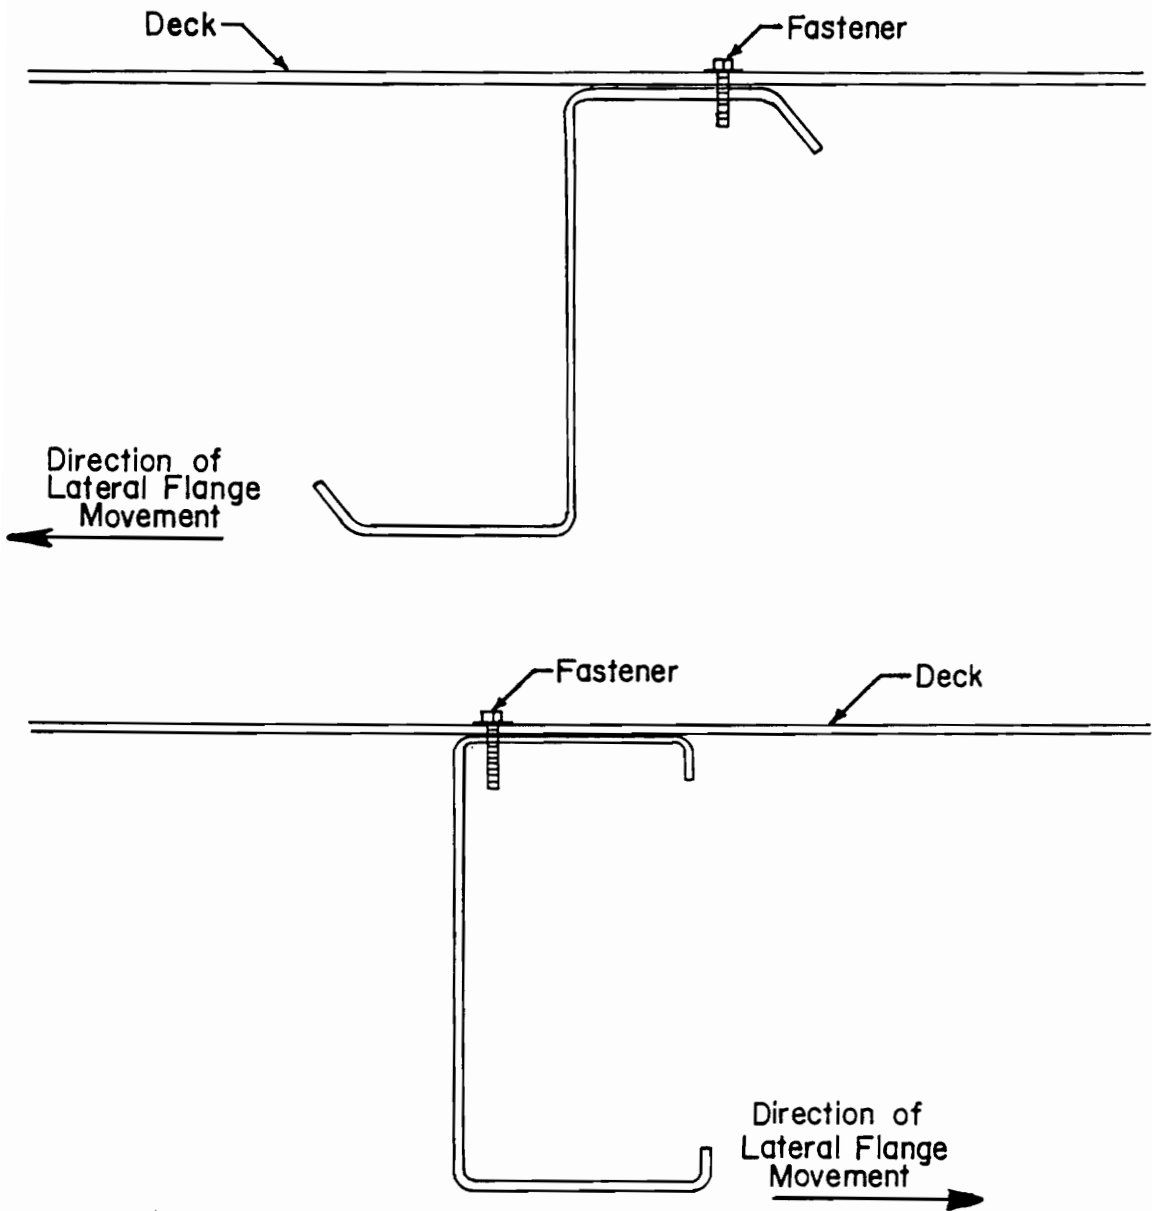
Fastener Location Resulting in Highest Purlin Capacity
